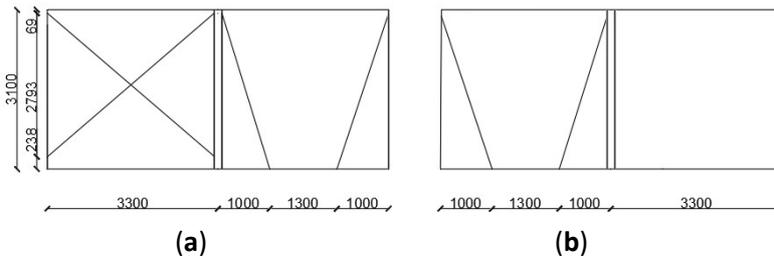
Variant 2.2 Strips: (a) Front facade, (b) Back facade.
